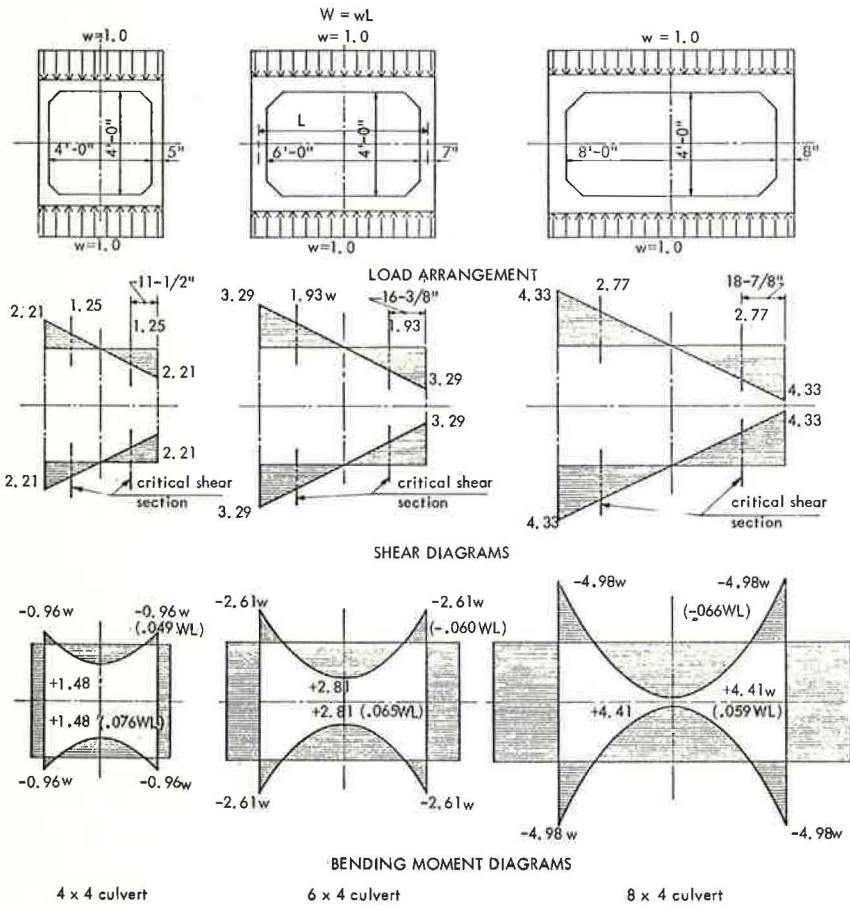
Load, shear, and bending moment for culvert subjected to uniform lateral earth load.
